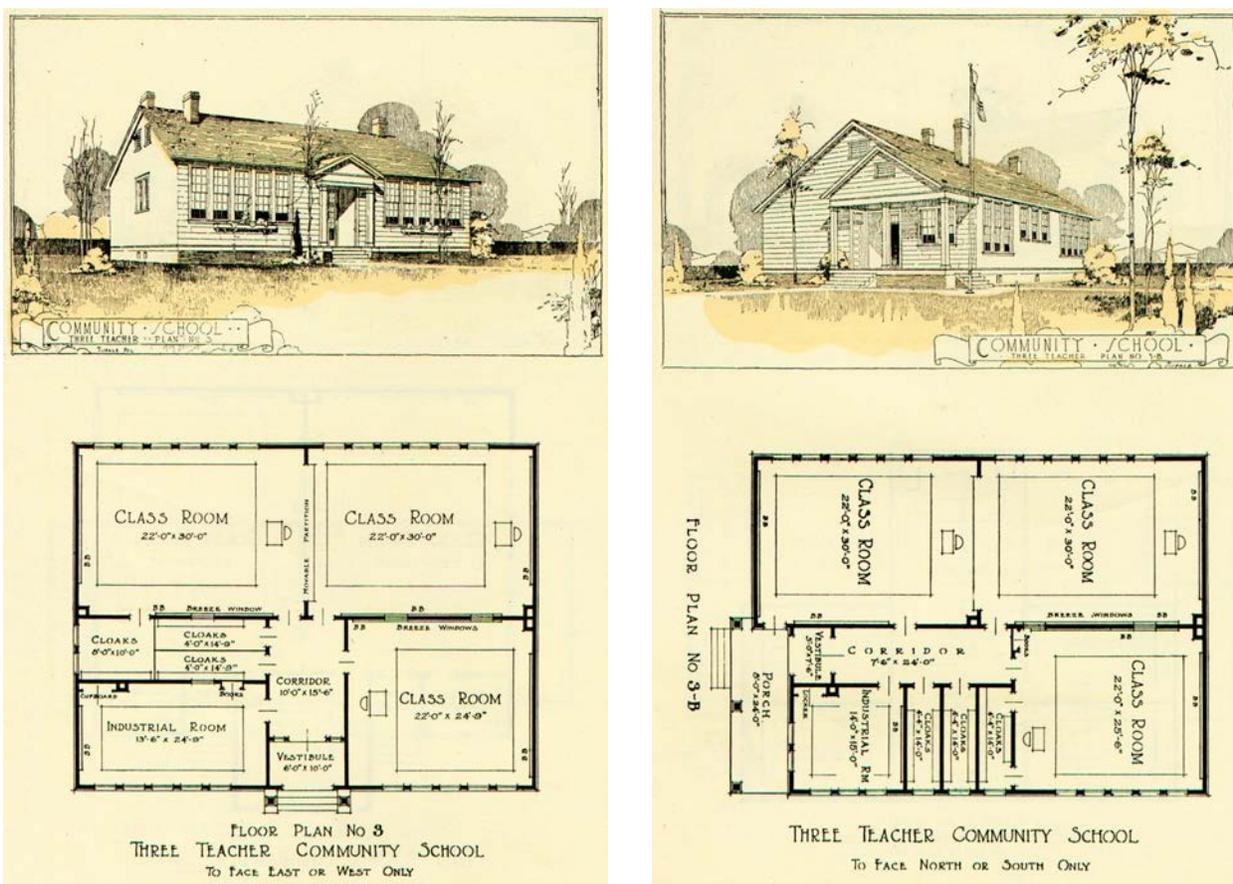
Plan 3 (left) and Plan 3-B (right) from the 1924 edition of *Community School Plans*.
